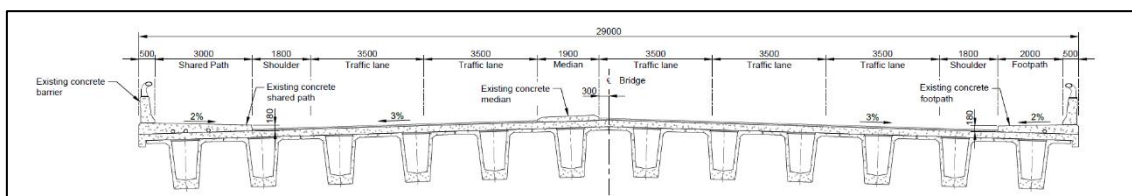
Existing PEI Bridge (Source: Tiaki Consultants Report – Appendix 10. The cross section is a view of the bridge looking towards the south)
